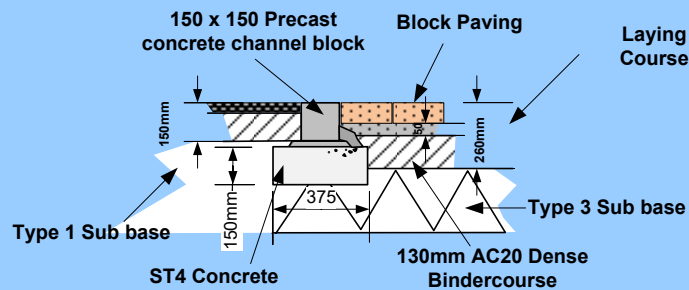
/2 TRANSITION – PERMEABLE PAVING TO TRADITIONAL CONSTRUCTION
